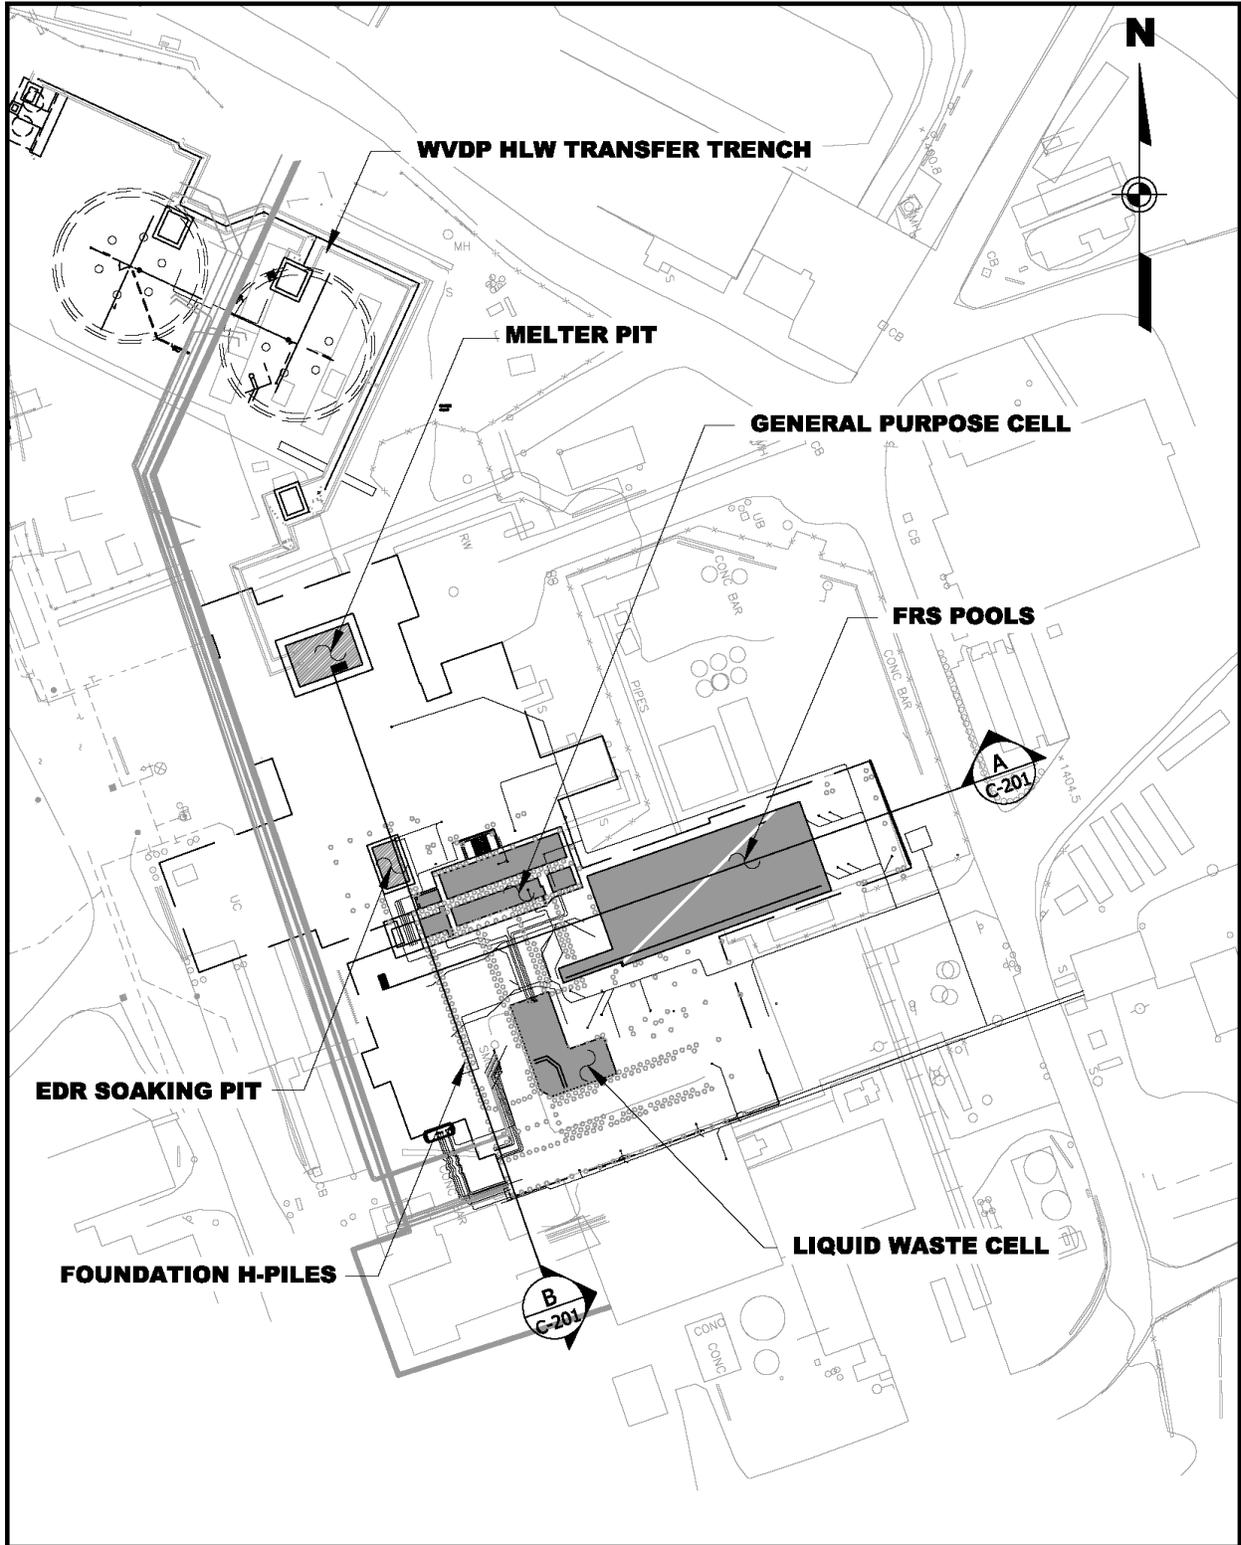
Main Plant Process Building Area Subgrade Facilities
